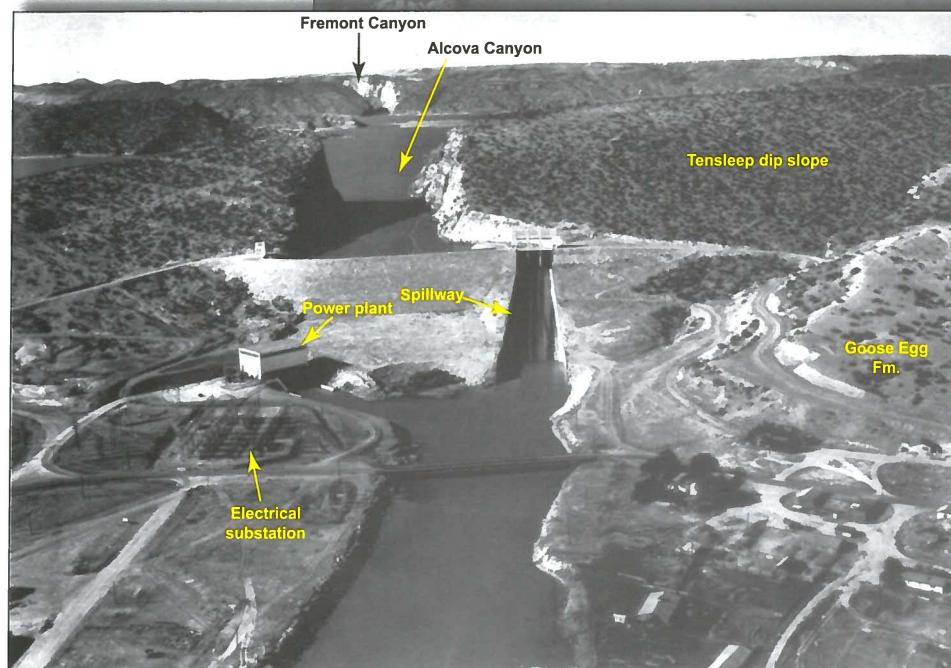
(left). Oblique air photograph of downstream side of the completed dam and power plant. Photograph from U.S. Bureau of Reclamation.
